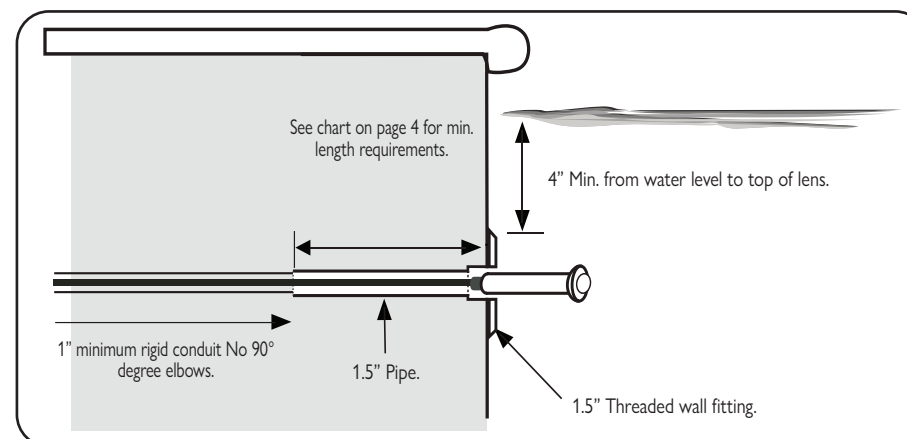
Standard Halco ProLED® Nicheless Light installation with 1.5" pool wall fitting.
